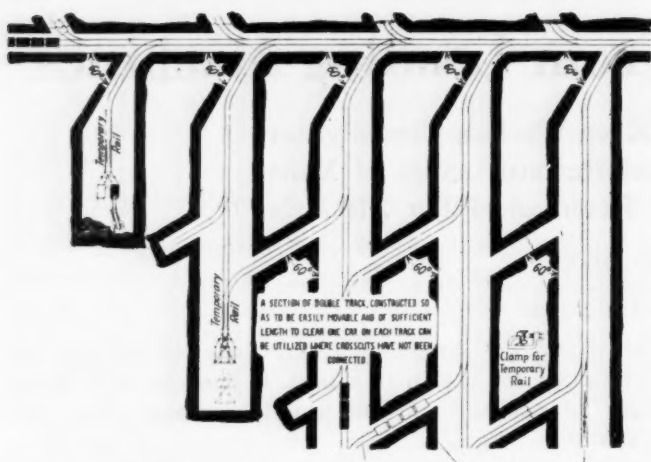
Trackage System for an Advancing Machine-Loading Panel
